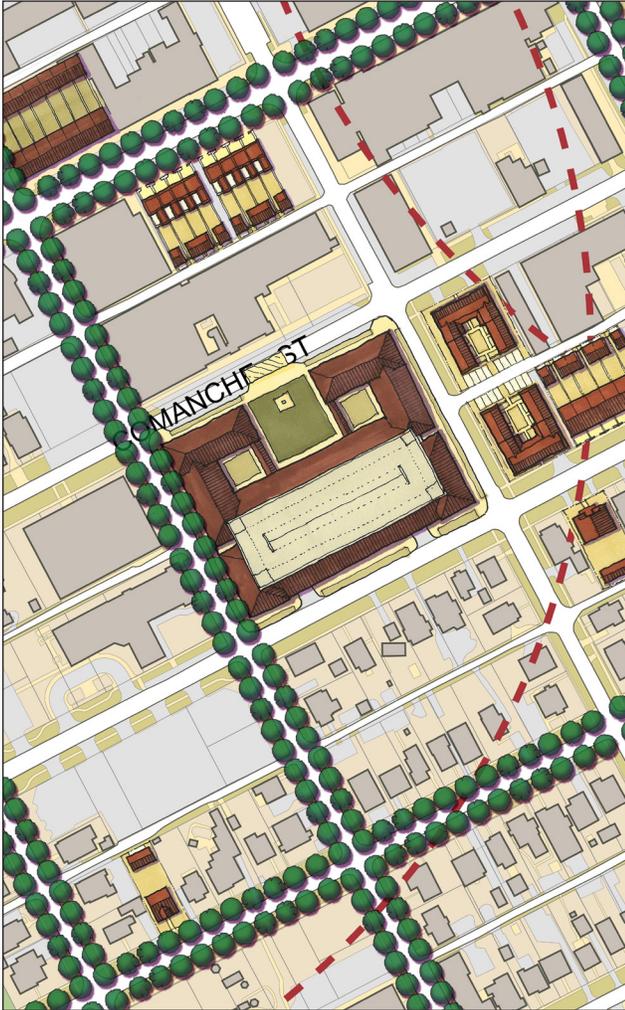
Development of the parking lot at Comanche and Webster showing a parking structure wrapped by buildings that houses church activities. Greenspace faces the main church entrance
